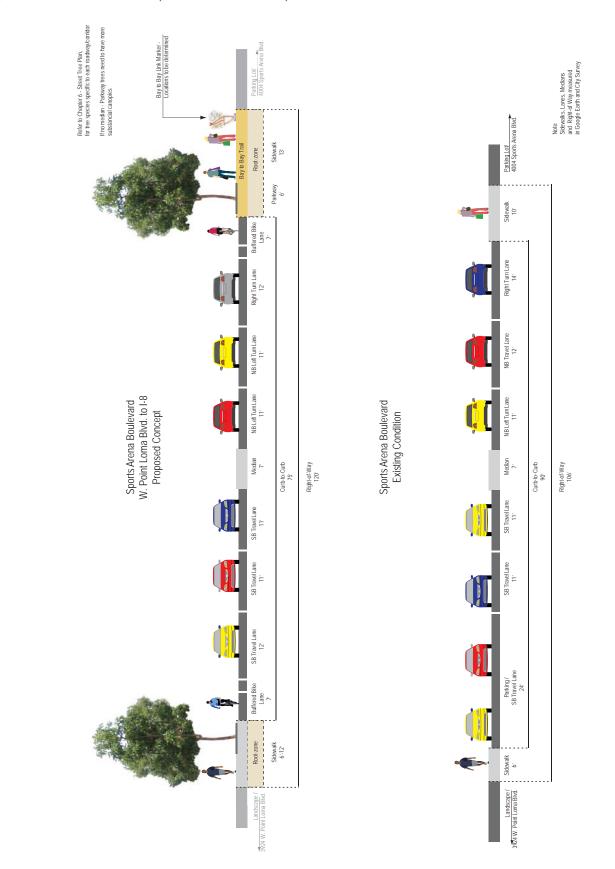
Street Concept Plan Exhibit - Sports Arena Blvd.., W. Point Loma Boulevard to I-8
